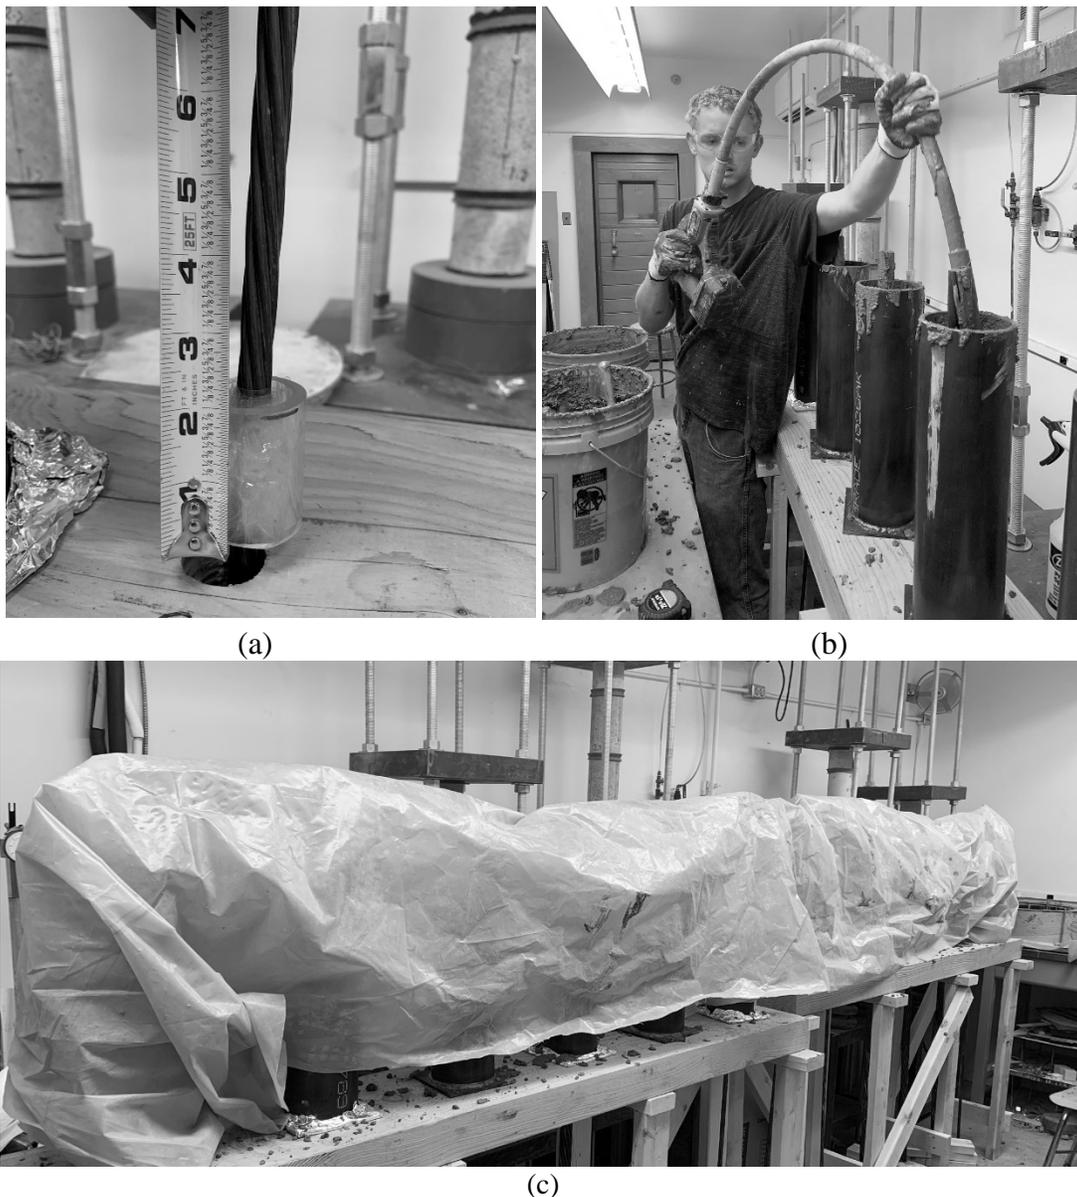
Specimen pouring: (a) debonded length of the strand, (b) mortar placing, (c) specimens covered and curing.
